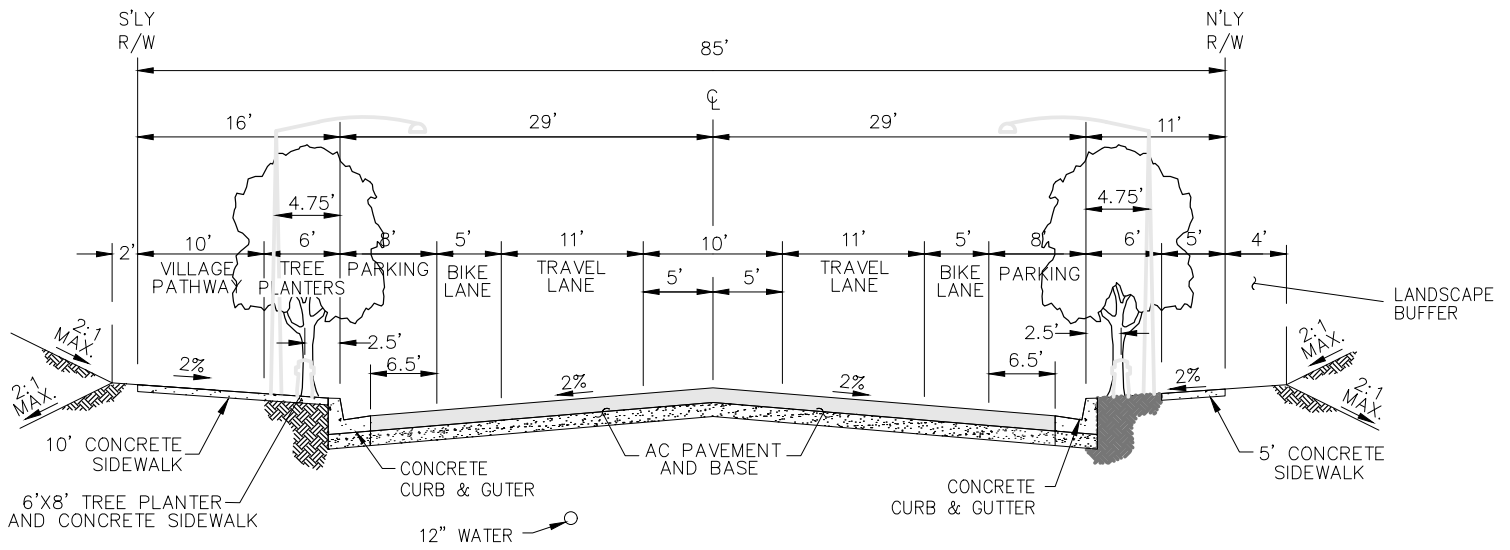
Calle Escuela (TM Street Section 9)
